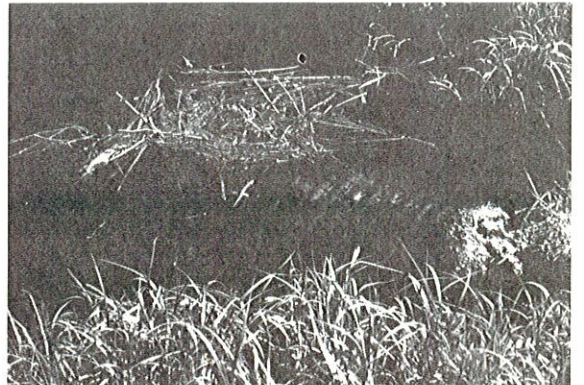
CULVERT OBSTRUCTED BY BEAVER ACTIVITY.
